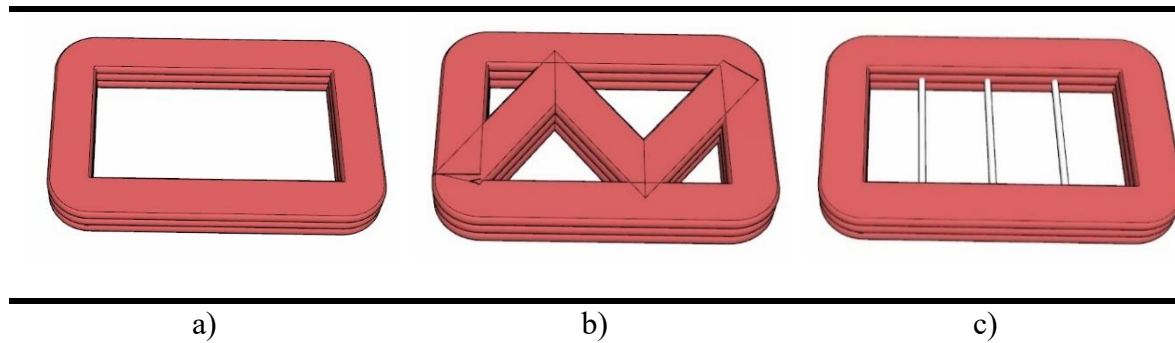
Schematic representation of a) simple box wall (OOP-B), b) zigzag inner wall (OOP-Z), c) crosstie reinforced wall (OOP-RS).
